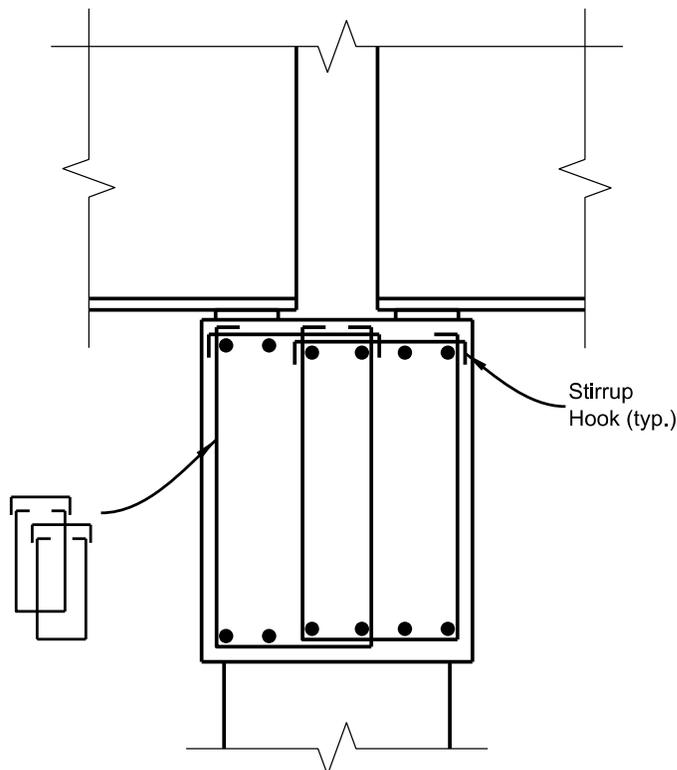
Pier Caps in Post-Tensioned Bridges with a Skew Angle of 20 Degrees or Less and Deck Reinforcing Parallel to Cap
